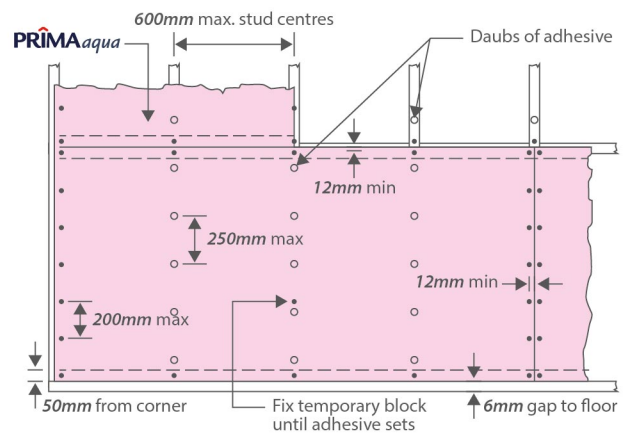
Adhesive and Fastener Fixing (Untiled Wall)
